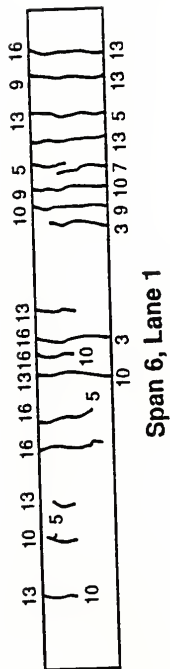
Crack Patterns, Bridge 40-49-7032
